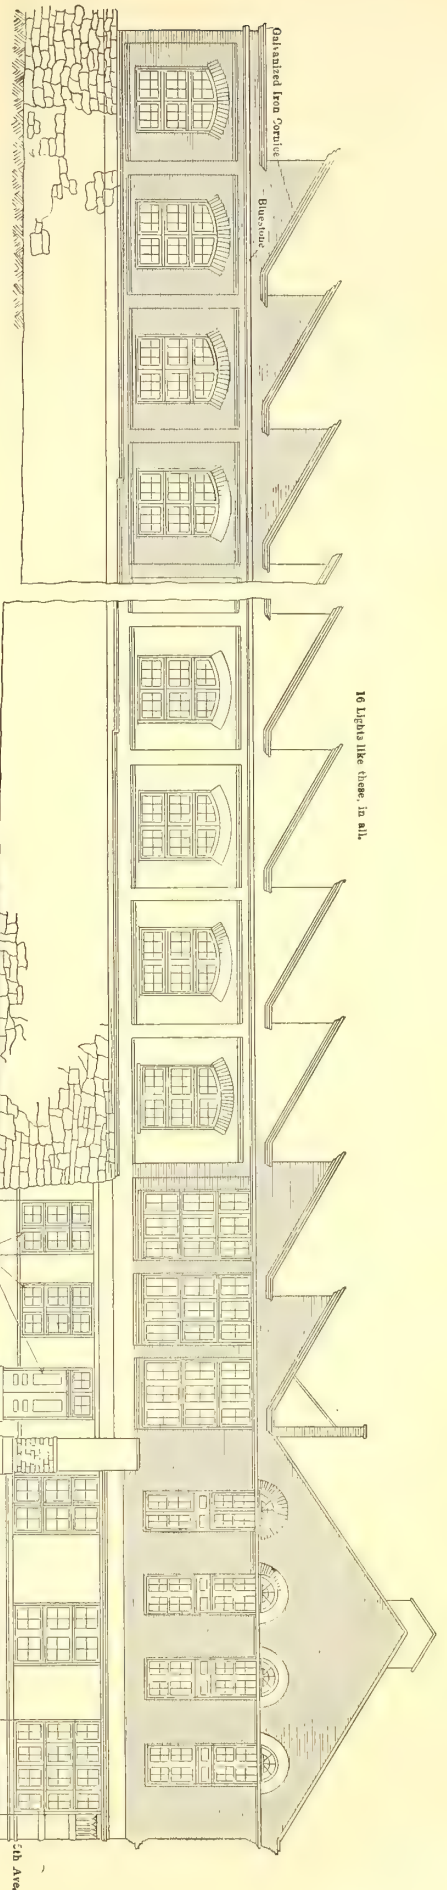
LONGITUDINAL ELEVATION OF THE THIRTY-SIXTH STREET INSTALLATION, SHOWING THE OFFICE BUILDING AND INSPECTION STRUCTURES
